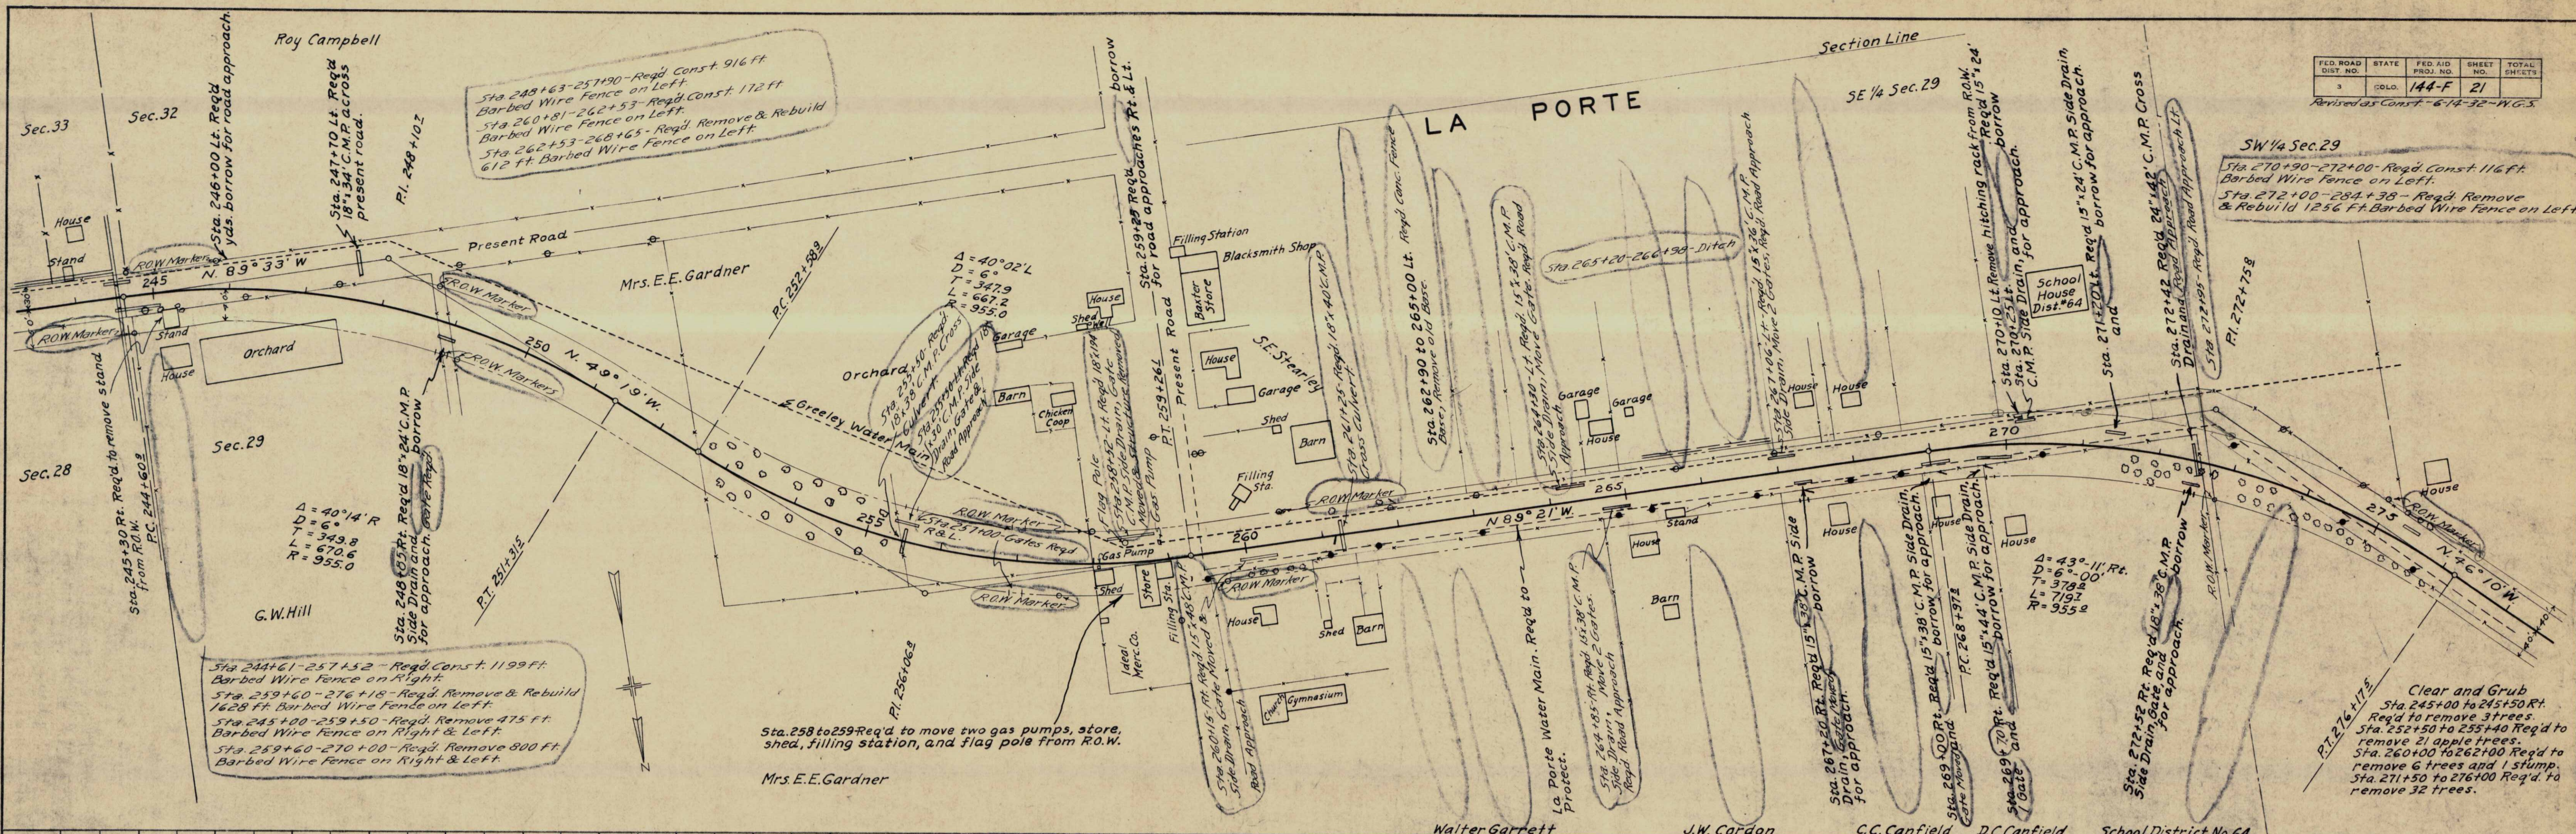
PLAN - PROFILE OF R.O.W. & R.E. ELEVATIONS
